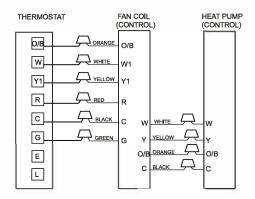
Wiring Layout Heat Pump Unit (Cooling and 2- Stage Heat)
